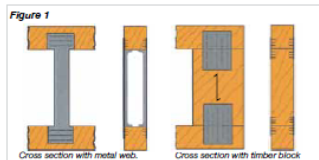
Example of cross sections for Kartro light stud. The space between the flanges is filled with mineral wool based on glass or stone. Timber blocks (min. width 95 mm) between the flanges can also be used for lintels and the mounting of windows and doors. The nail-plates shall be the approved Kartro PTN, min. size 52x78 mm, l. direction of the grain.
